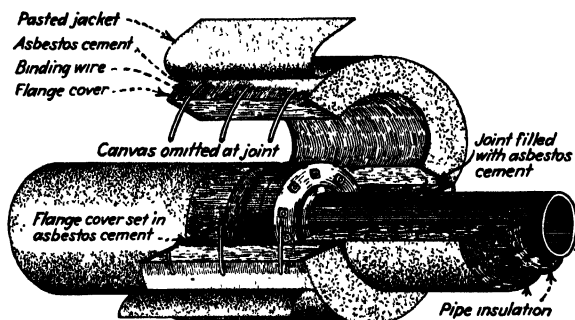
Removal and replaceable sectional insulation for flanges. (Courtesy of the Johns-Manville Co.)
